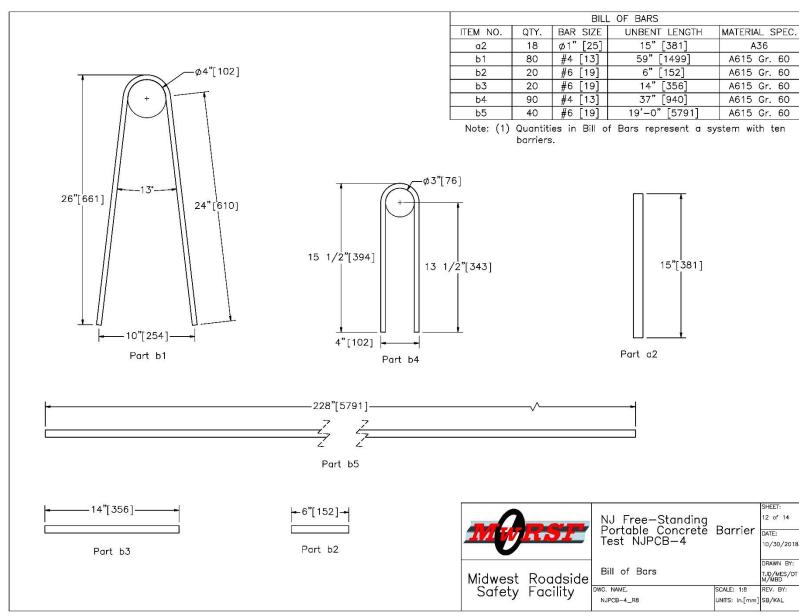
PCB Reinforcement Details, Test No. NJPCB-4
